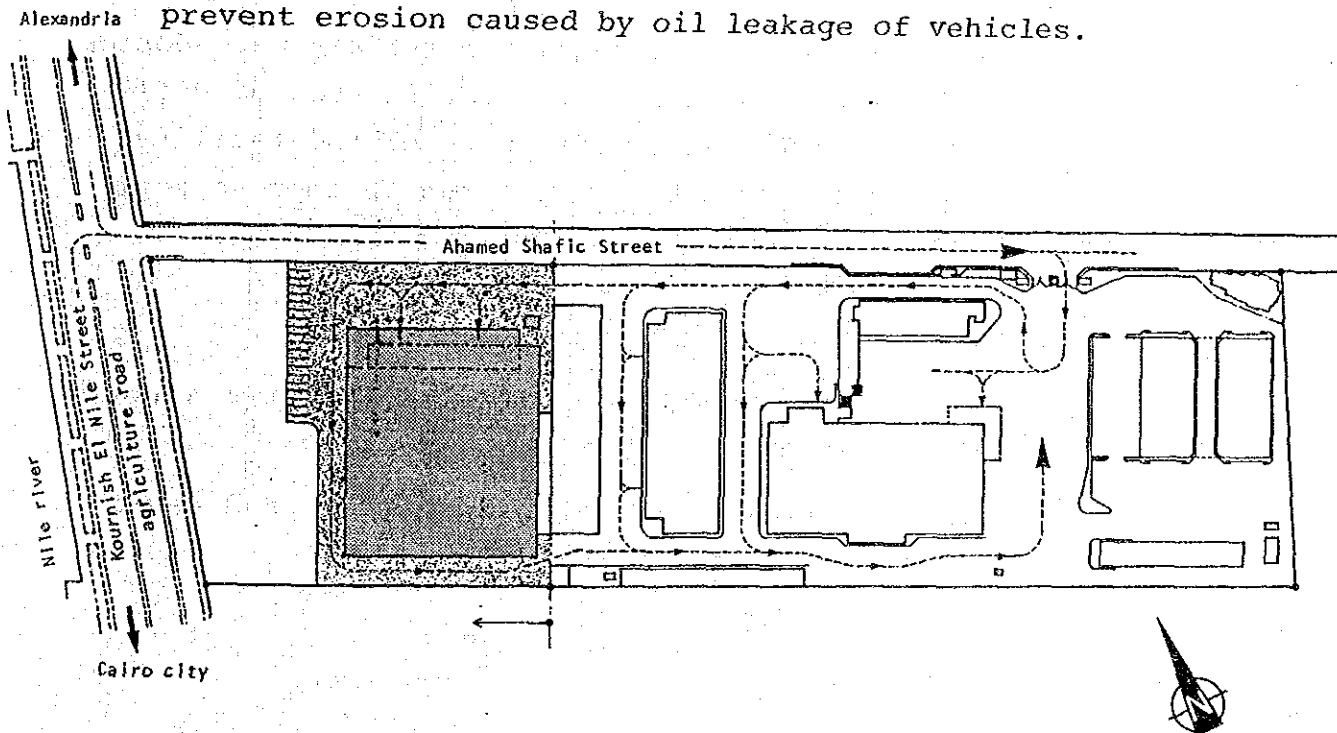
Layout of Facilities and Traffic Circulation Plan
